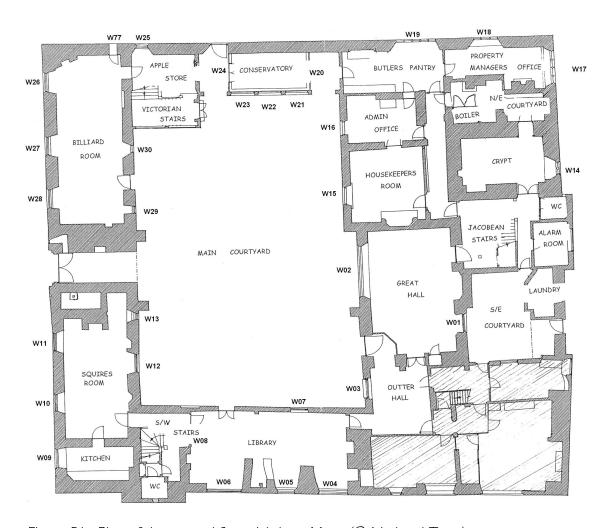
Plan of the ground floor, Ightham Mote (© National Trust)
